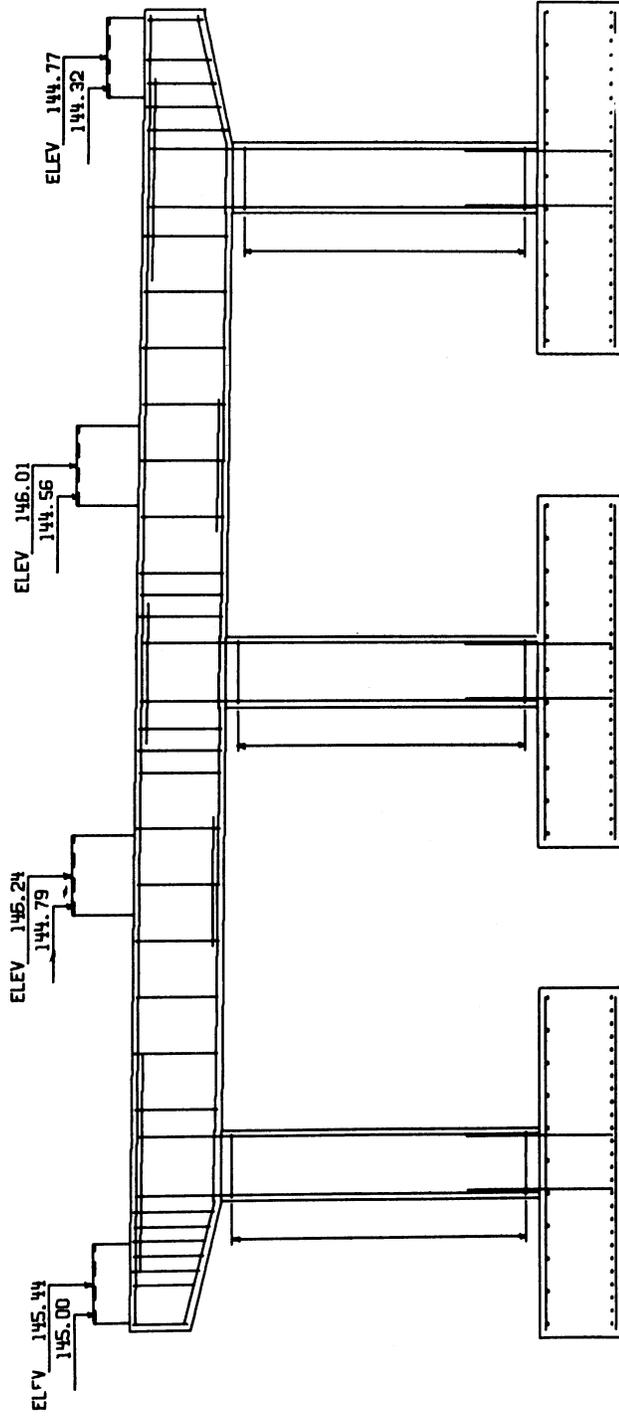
Pier reinforcing details designed and plotted by BEST system.
